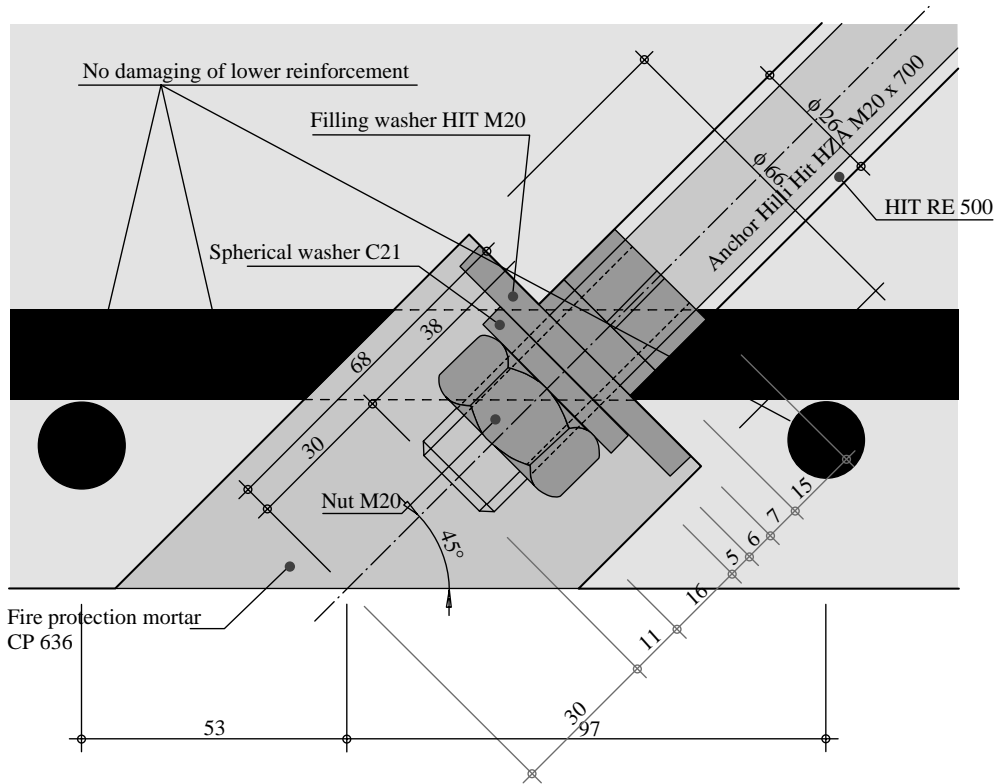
Construction detail, lower anchor head (Units: mm)
